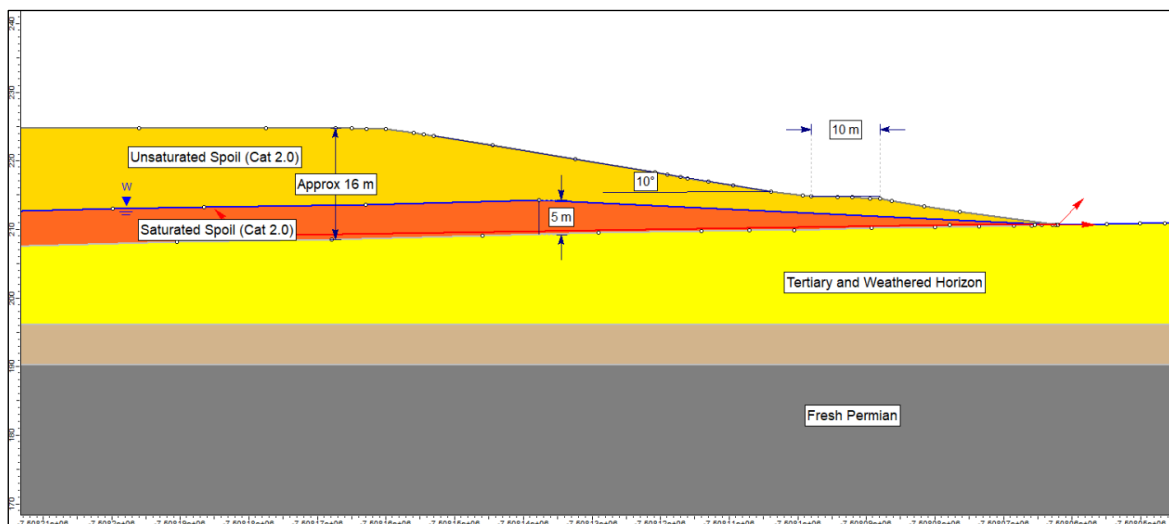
Northern Ex-Pit Spoil Dump - Section 5 (Southeast Facing)
